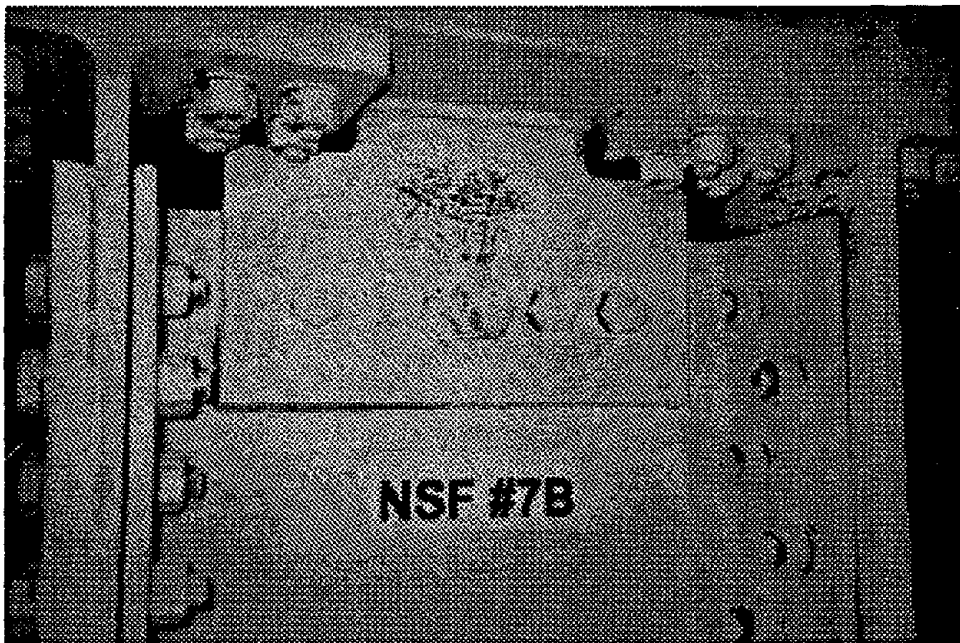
Photograph showing the shear plate and the pivot bolt of Specimen 7B after test.
